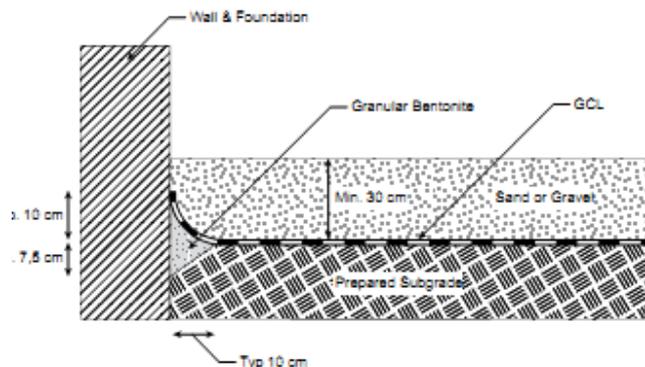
Cross-section of Claymat GCL seal against an embedded
